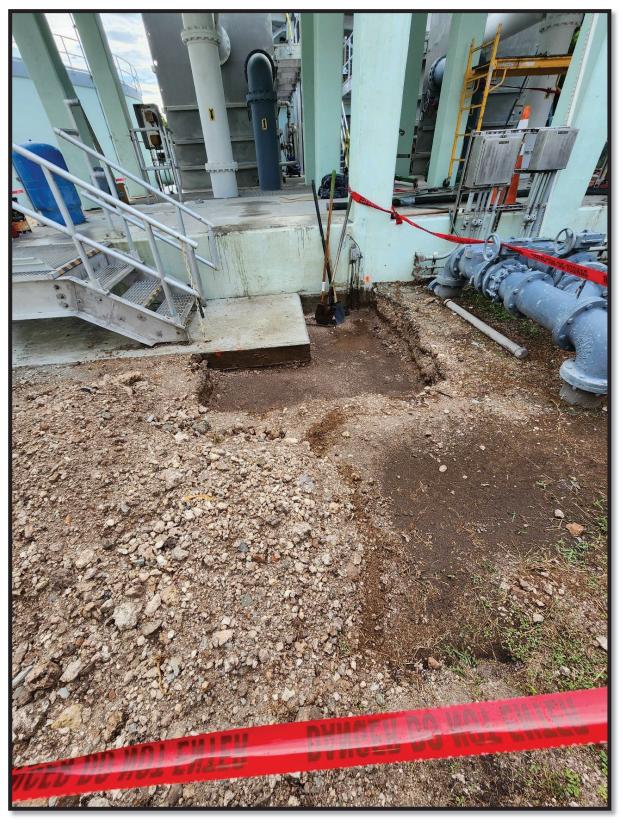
Trench to Extend Concrete Pad for Stair Leading Up to Existing Filters
